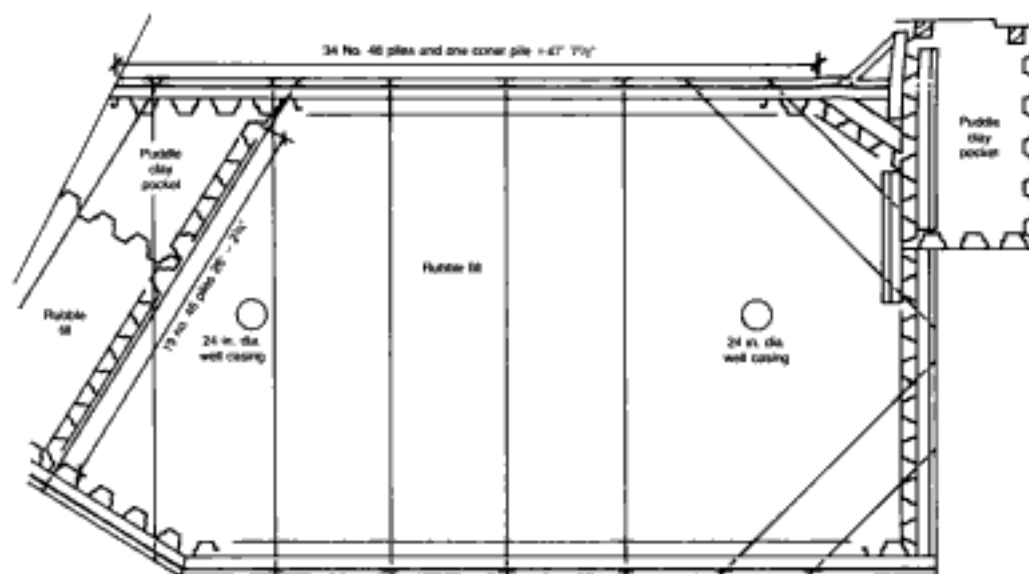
Typical detail in plan of strongpoint in a double-walled cofferdam (German Waterfront Code¹⁸)
